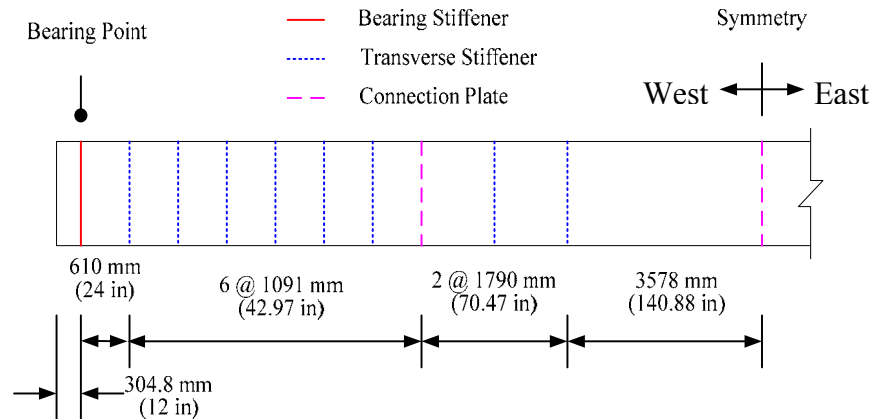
G3 – location layout for bearing stiffeners, transverse stiffeners and connection plates.
